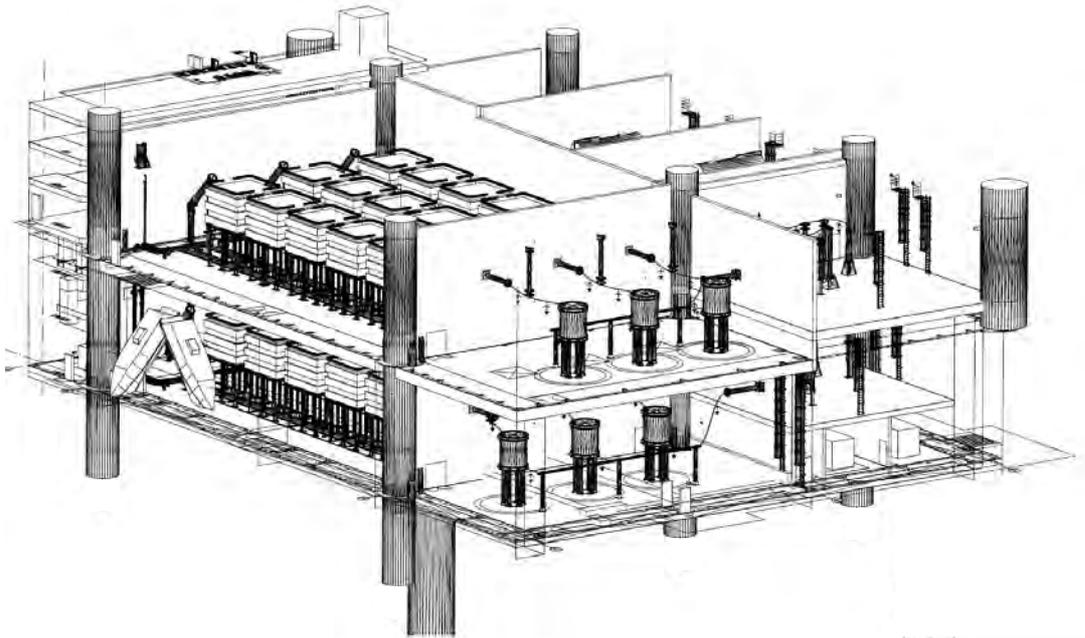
Crossectional view of offshore platform BorWin2 with HV equipment.
